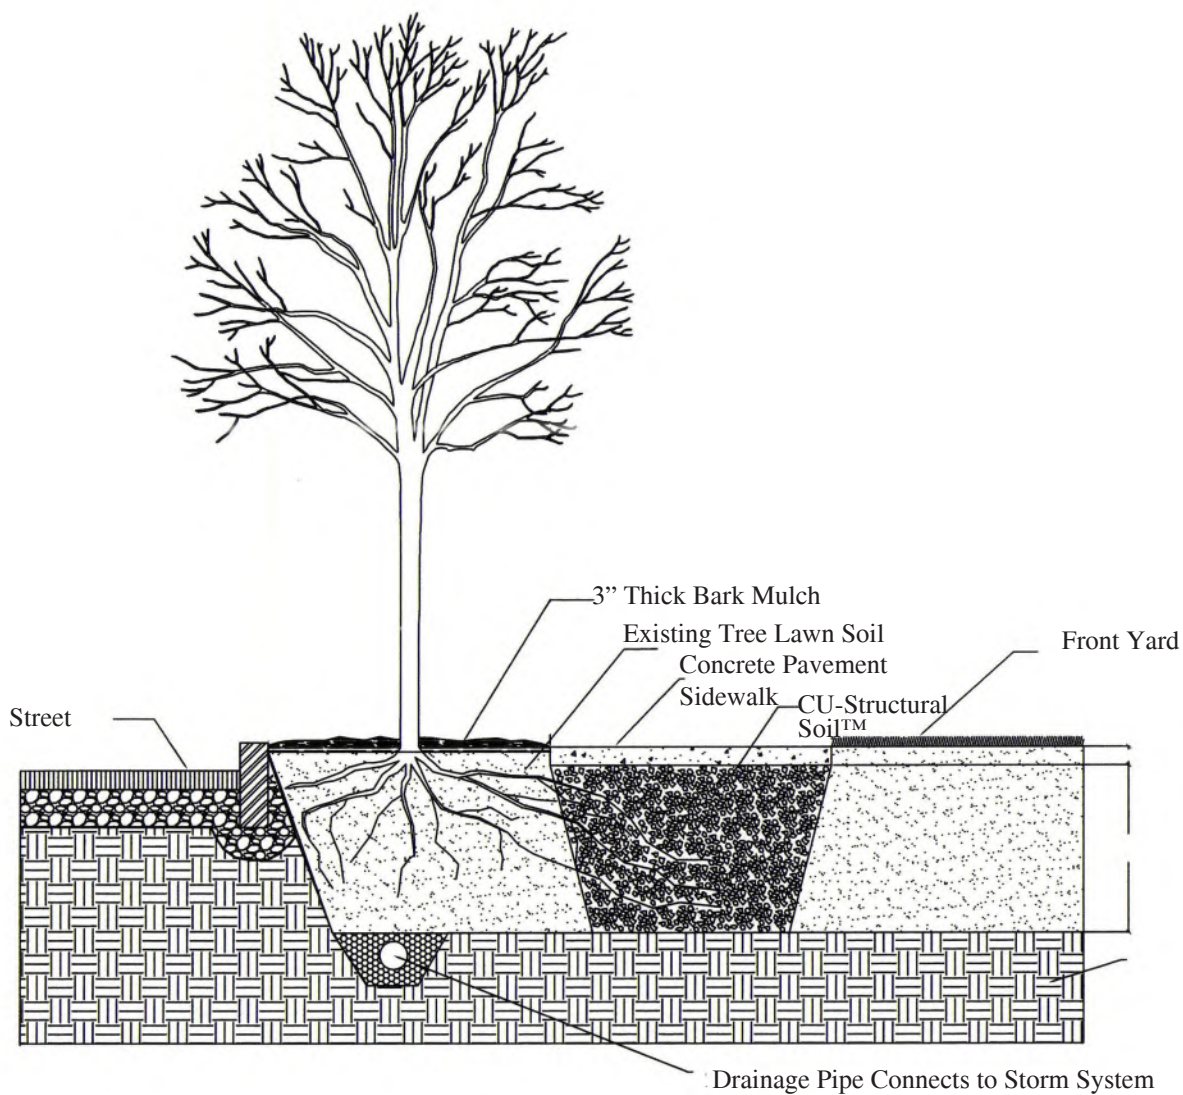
CU-Structural Soil™ break-out zone from narrow tree lawn to adjacent landscape area
